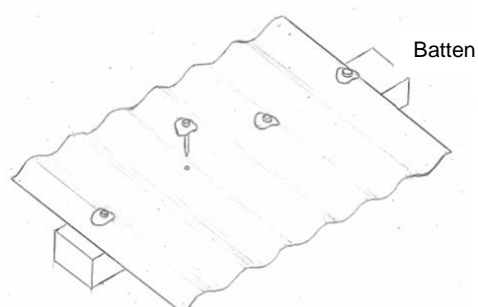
Upgrade A, installation of roofing screws with cyclone washers.
